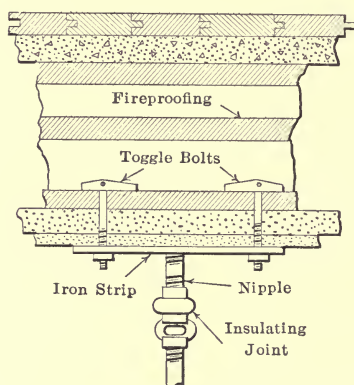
SUPPORT FROM A FIREPROOF CEILING.
